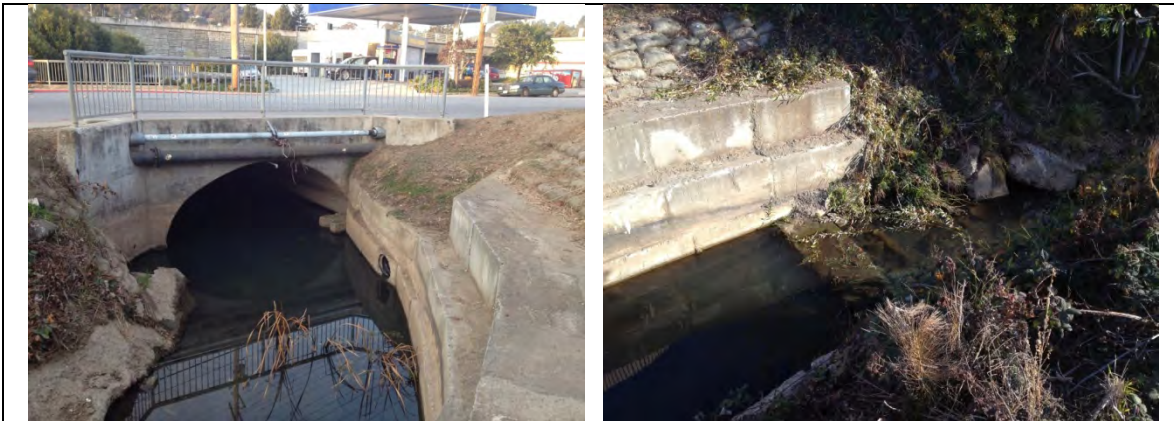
Taken at the downstream end of the culvert crossing Old County Road
